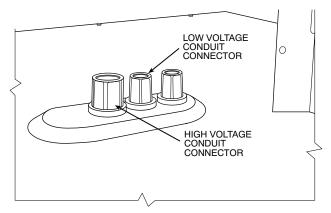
Thru-Base Connection Fittings (Sizes 090-102)
